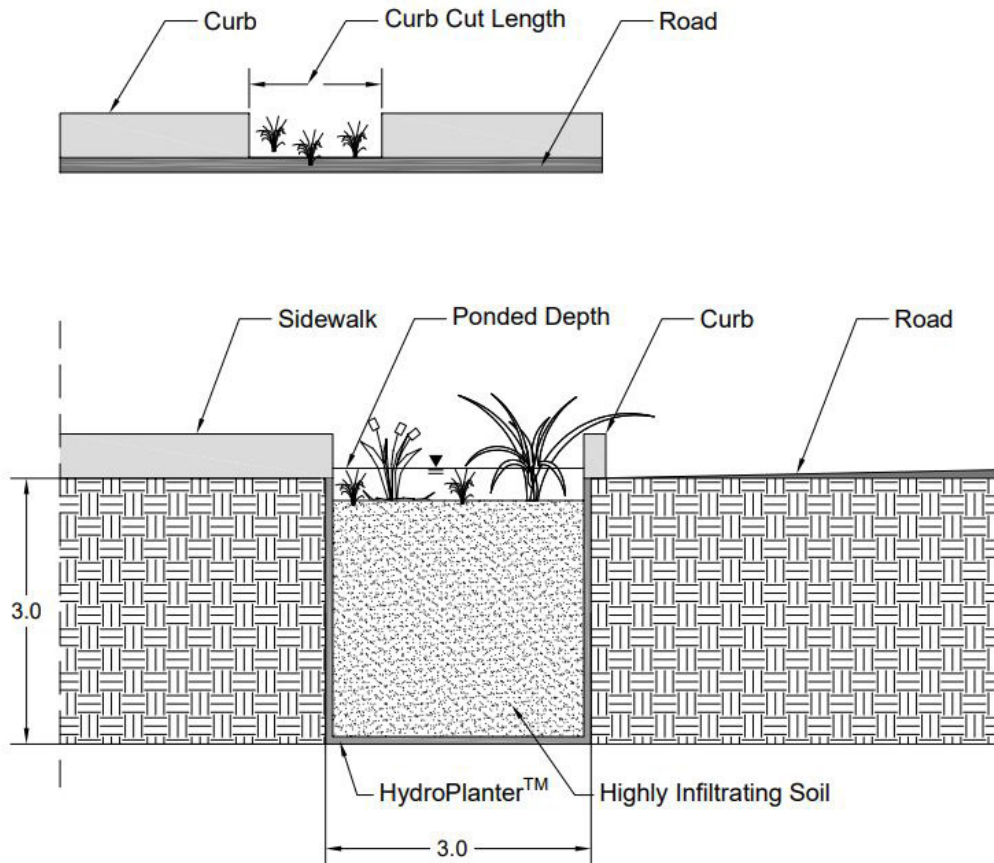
Cross section details for the curb cut rain gardens. Dimensions shown are in feet.
